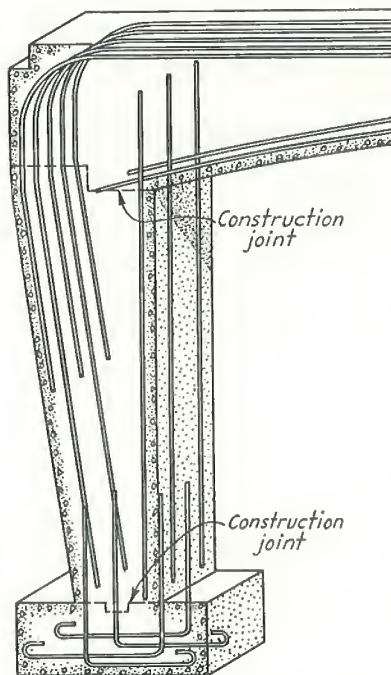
Typical connection between deck and abutment in a rigid frame bridge. Main reinforcement only is shown. Transverse reinforcement also essential.
